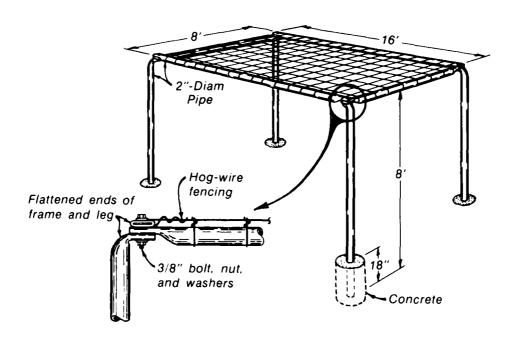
Construction and assembly details for pipe roost (after MacGregor 1950)
